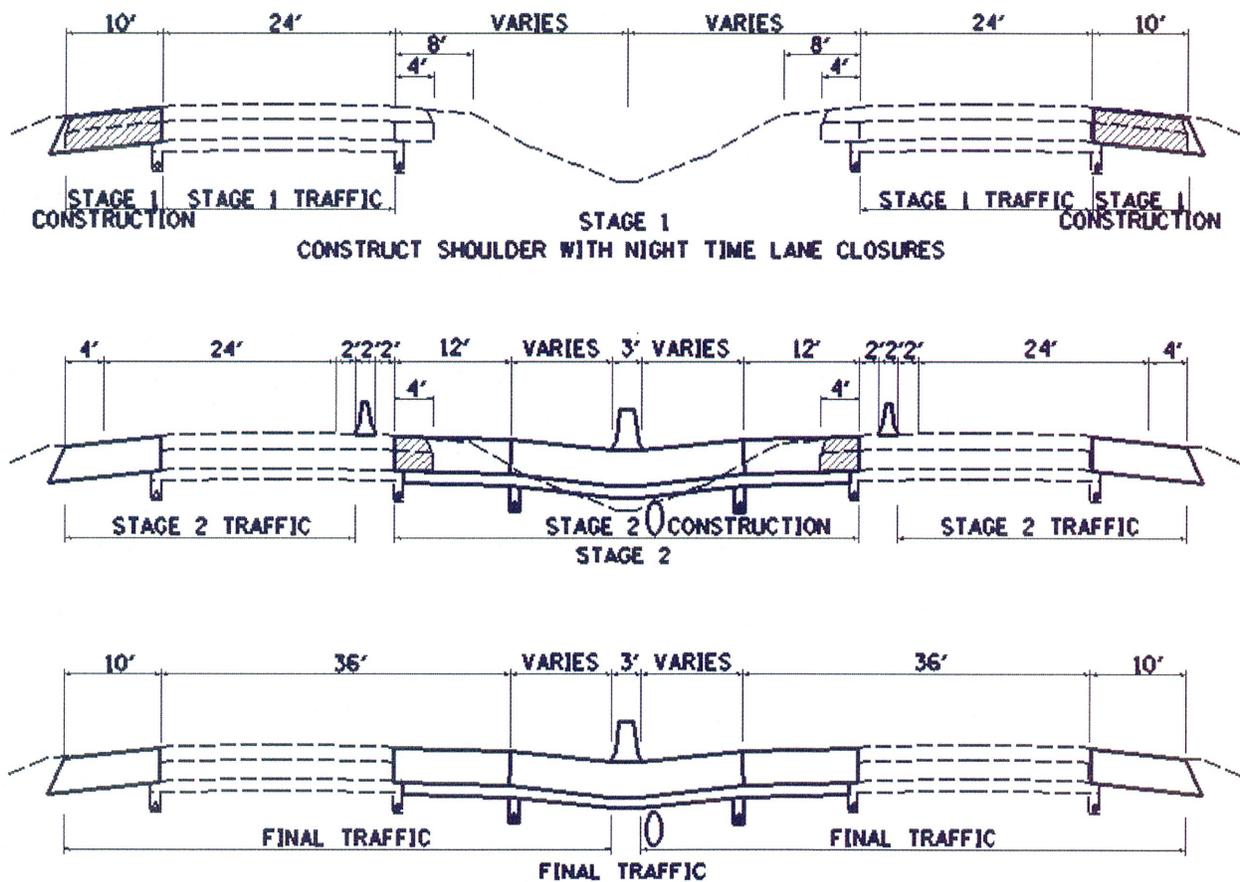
STAGE CONSTRUCTION LAYOUT – INSIDE WIDENING
